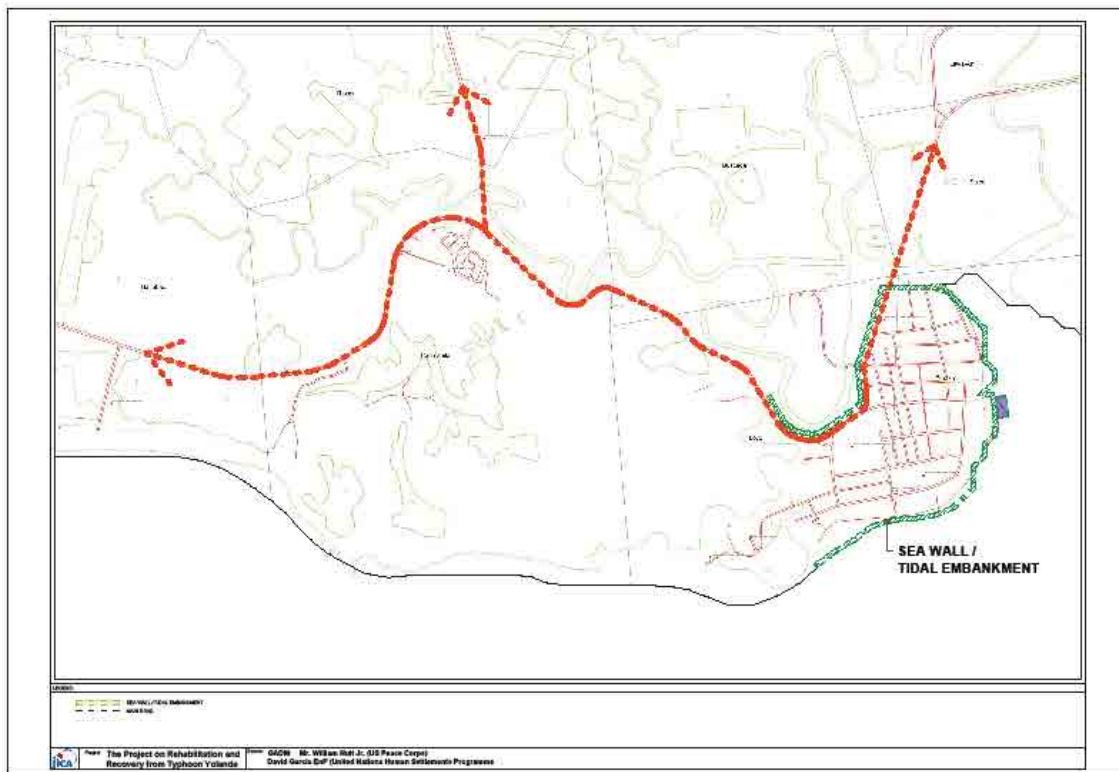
Revised proposal for development and relocation plan of Poblacion (alignment of sea wall or tidal embankment) (2/2)
